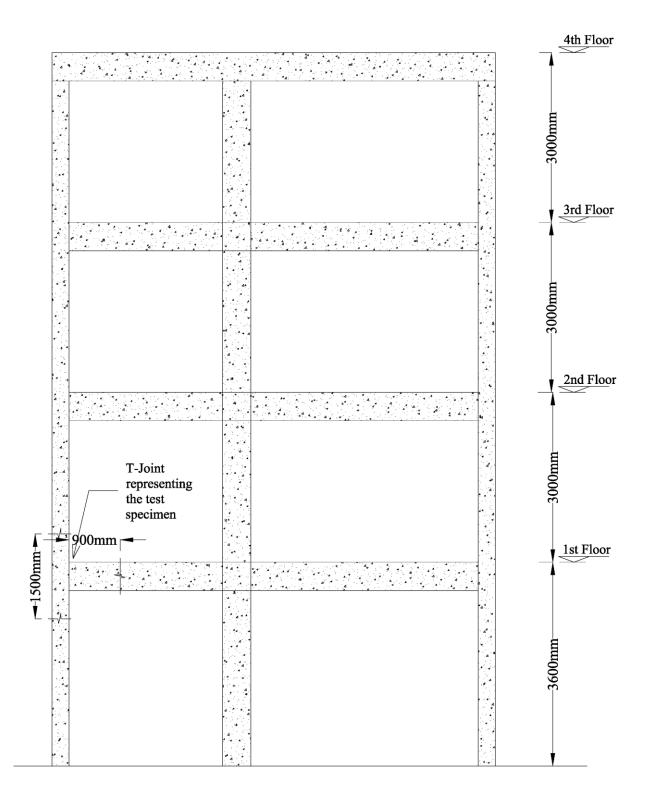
Exterior Beam-Column Joint of a typical beam-column frame representing the test specimen
